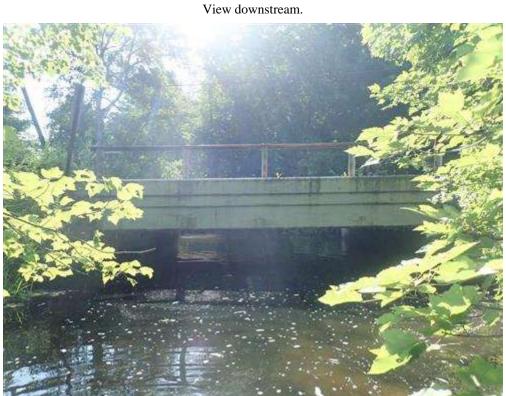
Photo Taken: 08/05/2020 Outlet elevation.
